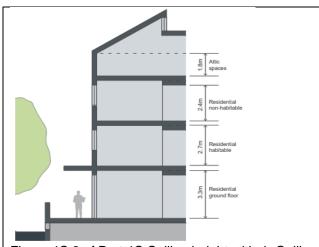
C.2 of Part 4C Ceiling heights titled: Ceiling heights of minimum 2.7m help to achieve good daylight access and natural ventilation to residential apartments
